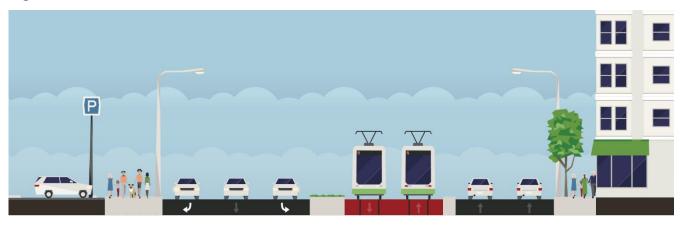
104 Avenue Facing East (West of 121 Street)
